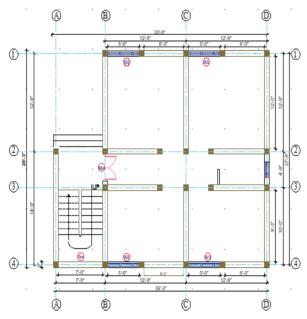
Building Model A_{il} for 3, 4 and 5 storey.
